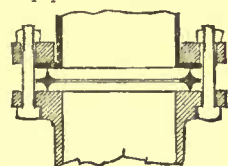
Section of Lead Connection with Flanged Pipe.
